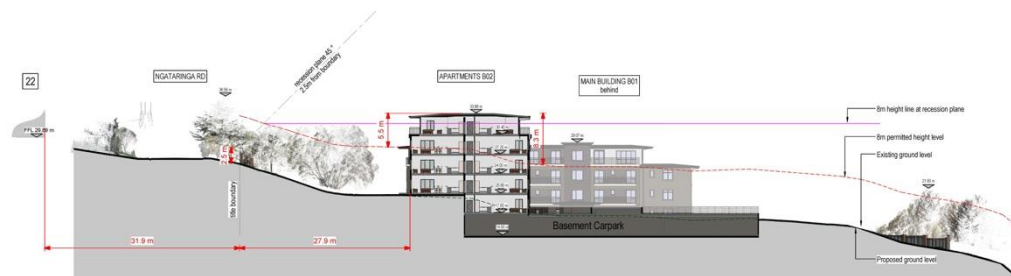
The Ngataringa Road elevation of the proposed retirement village, looking from the road towards the south.
